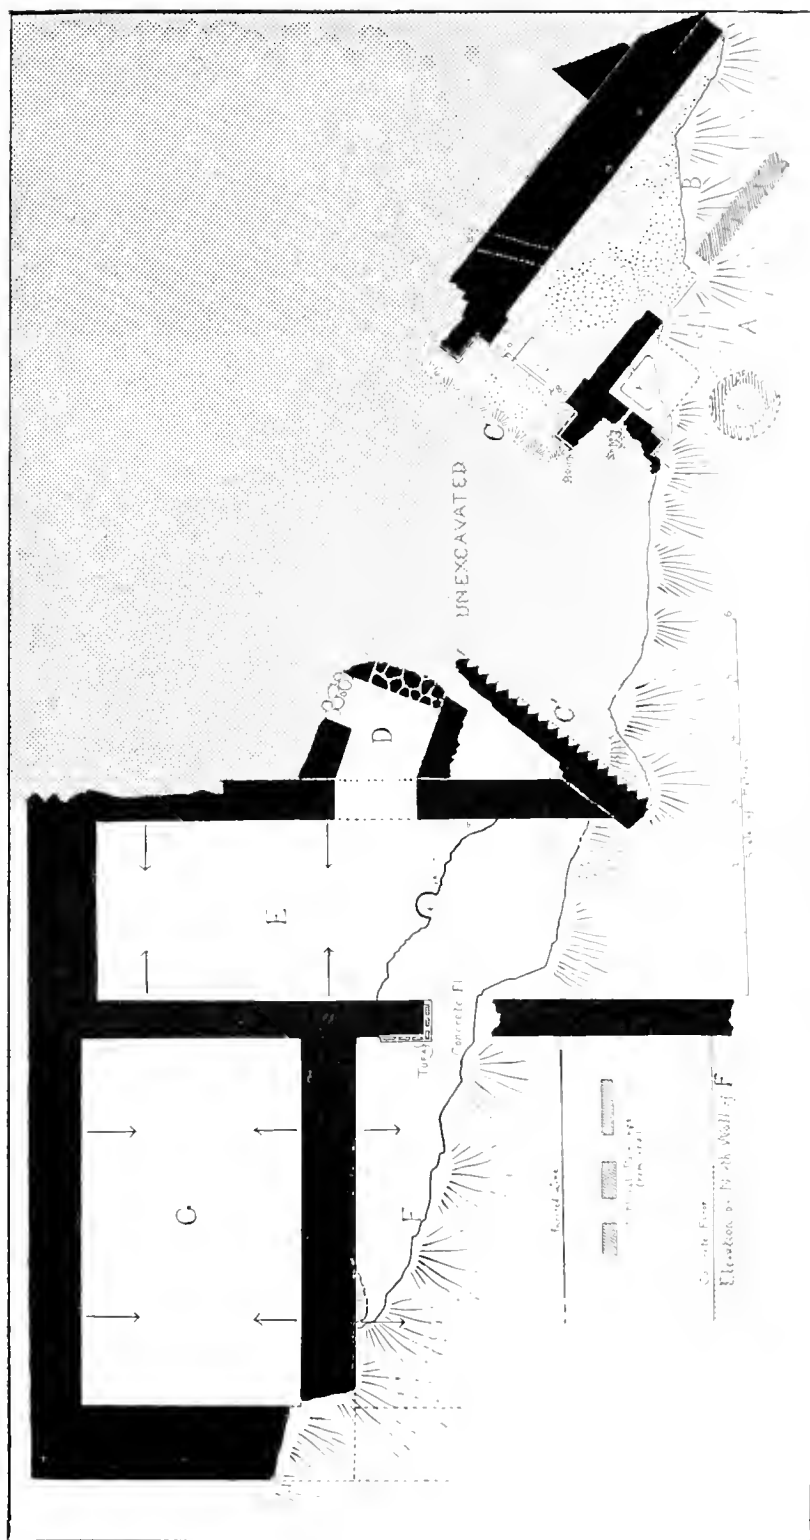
PLAN OF UPPER BATTIS. LOWER STOREY.
